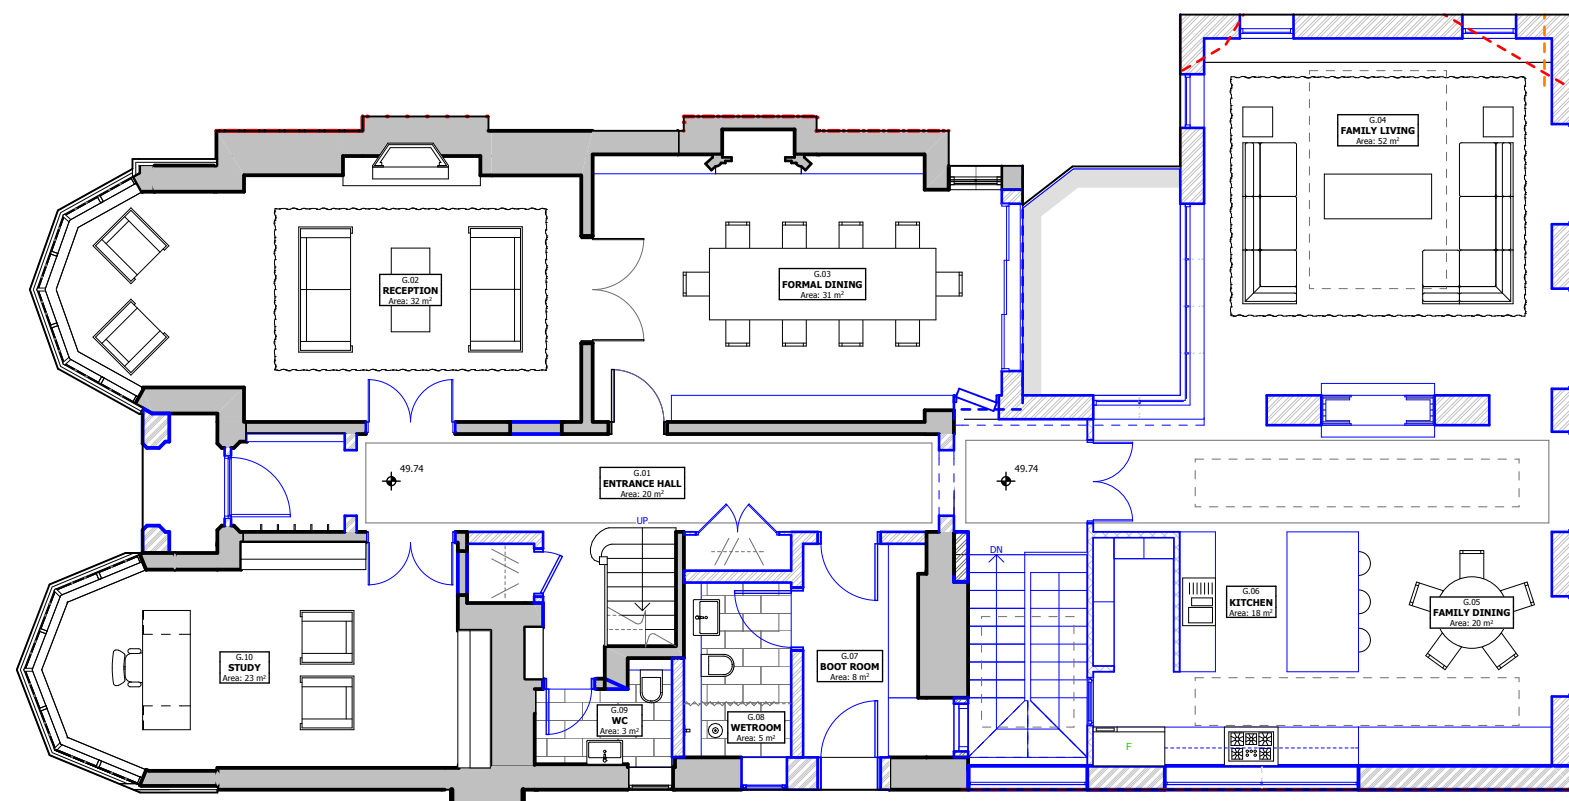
Proposed plan of Ground Floor (NTS)
